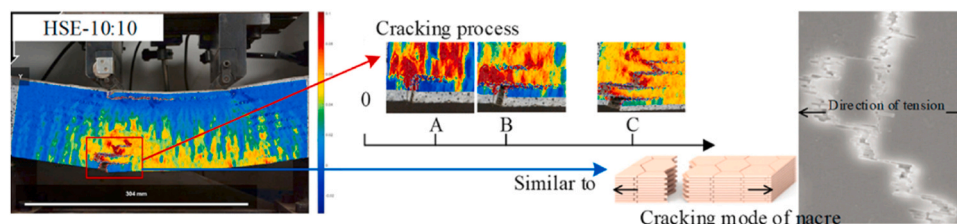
Crack patterns and mechanical characteristics of 3D-printed concrete beams [147].
